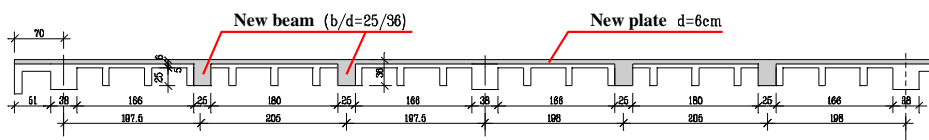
The arrangement of the new RC beams and the slab in the existing floor structure
